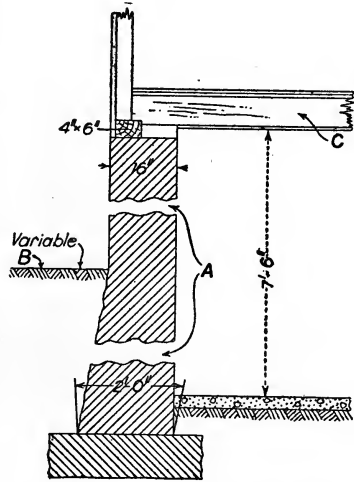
SECTION OF FOUNDATION WALL—SCALE  $\frac{1}{4}$  IN. TO THE FOOT
